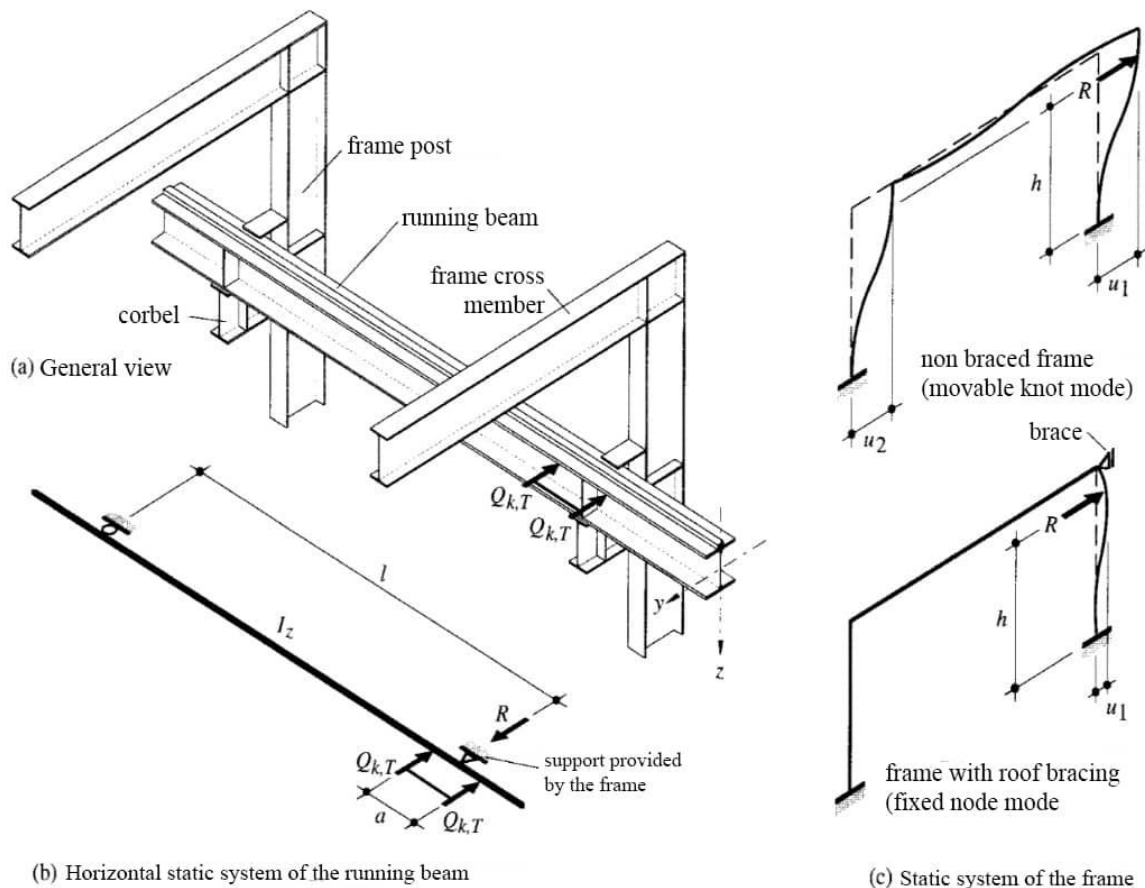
Transverse forces on the beam (a) General view (b) Static system of the running beam (c) static system of the frame (Hirt, 1949)
